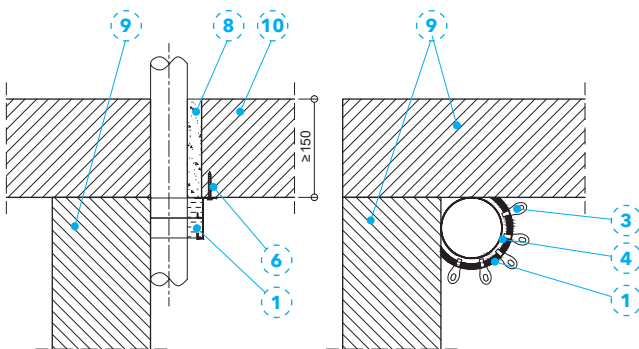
Detail D - Installation of collars under floor sealed with mineral wool and firestop compound
